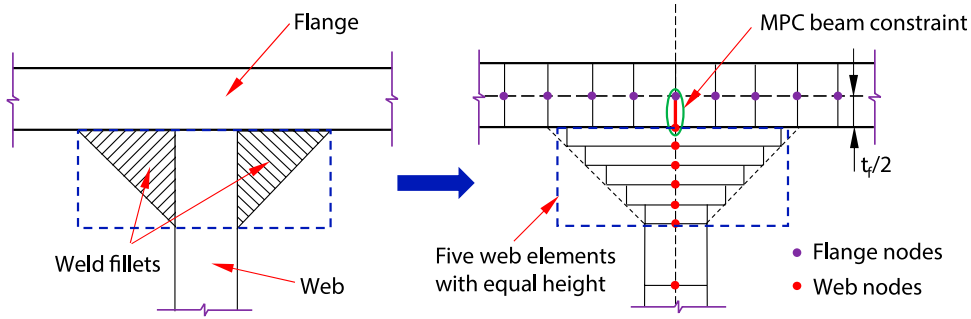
Modelling approach for representing weld fillets in welded I-sections.
